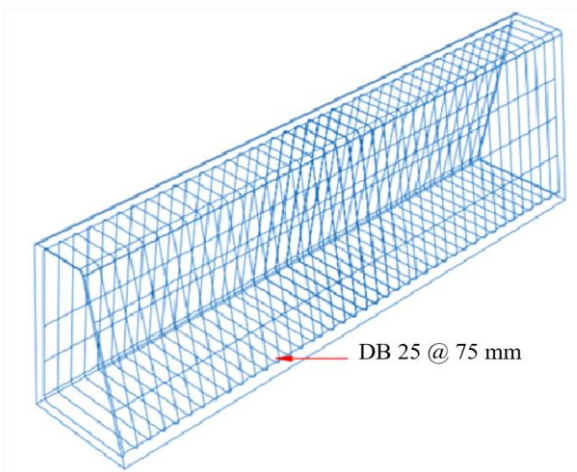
Arrangement of reinforced steel bars and stirrups in the barrier
